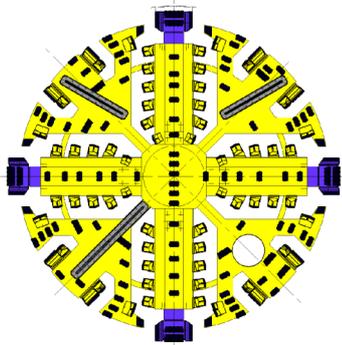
Structural Drawing of Machine for Kawagoe Picture 1 Shield Machine for Kawagoe
